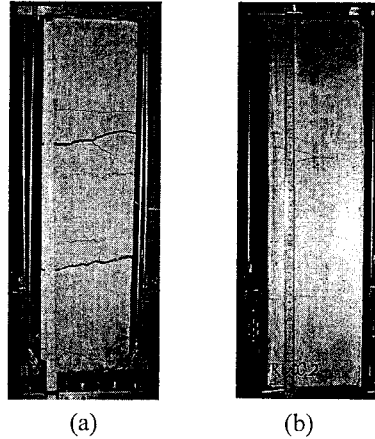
(a) Fracture of Concrete in R/C Specimen, and (b) Damage Pattern in R/ECC Specimen
